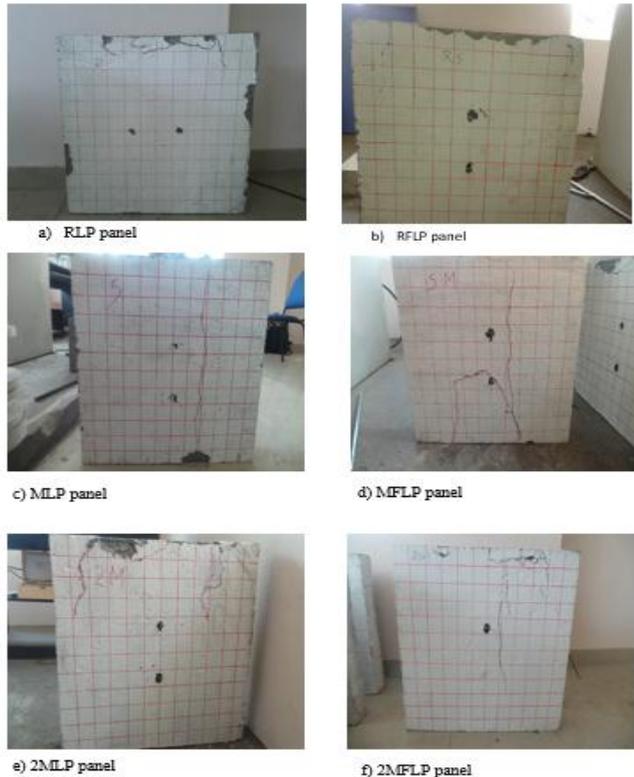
Failure pattern of lightweight concrete wall panels
